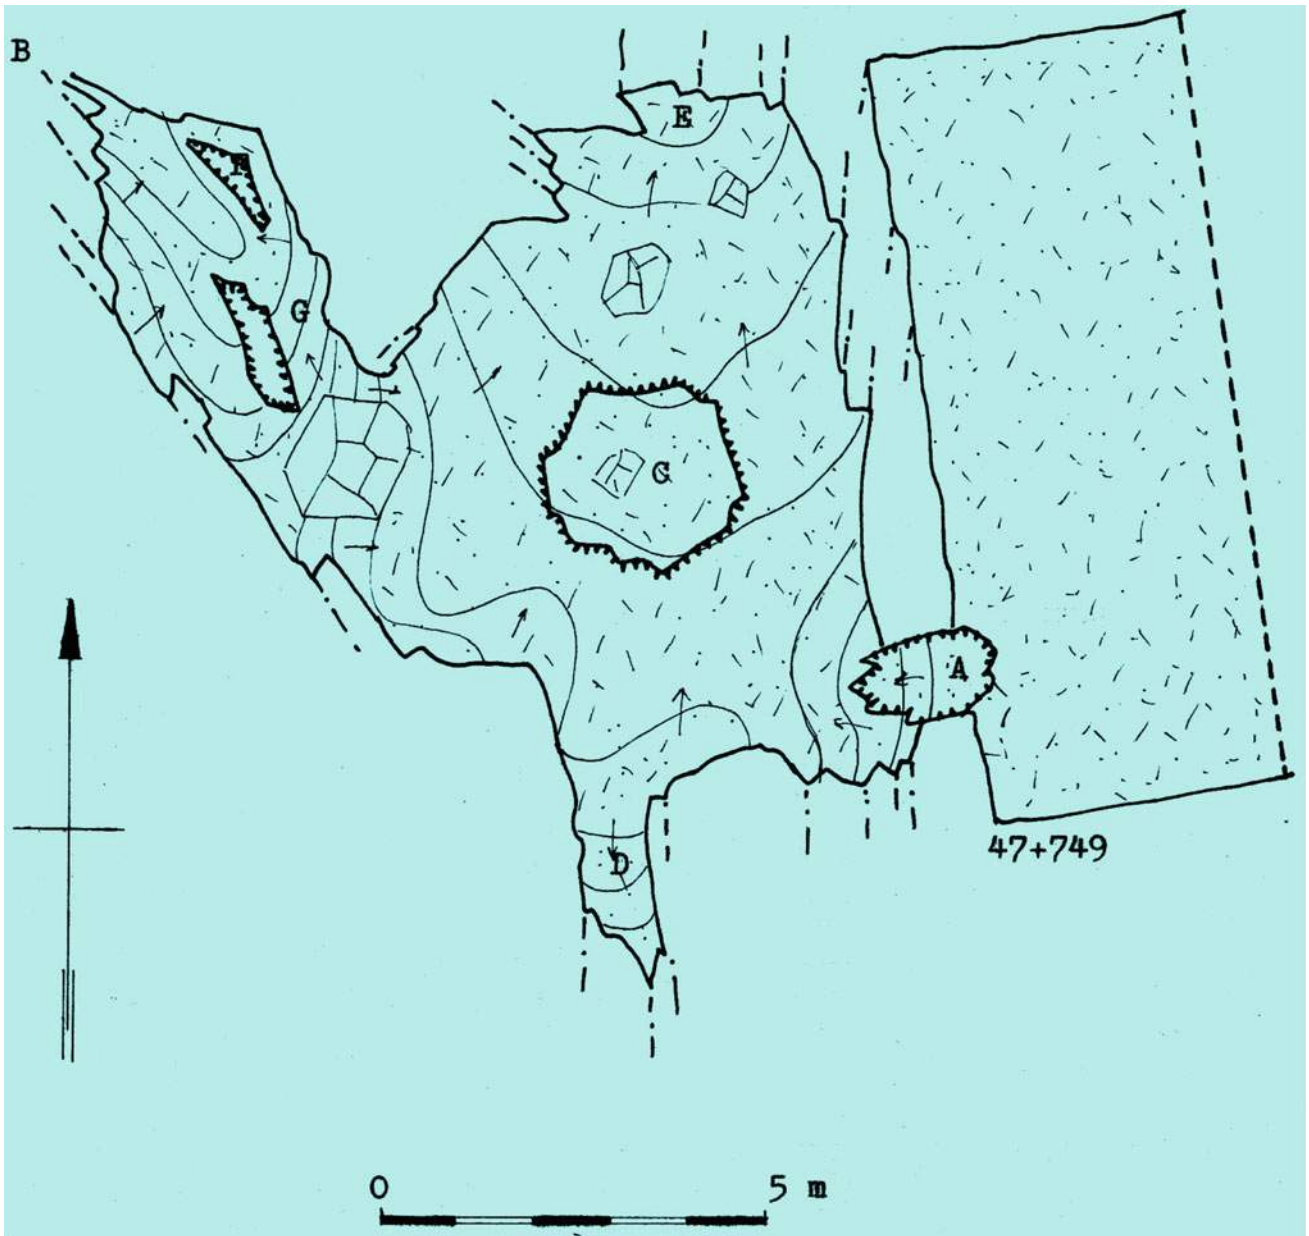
Plan of cavern at km 47 + 747 in Vršek Tunnel
